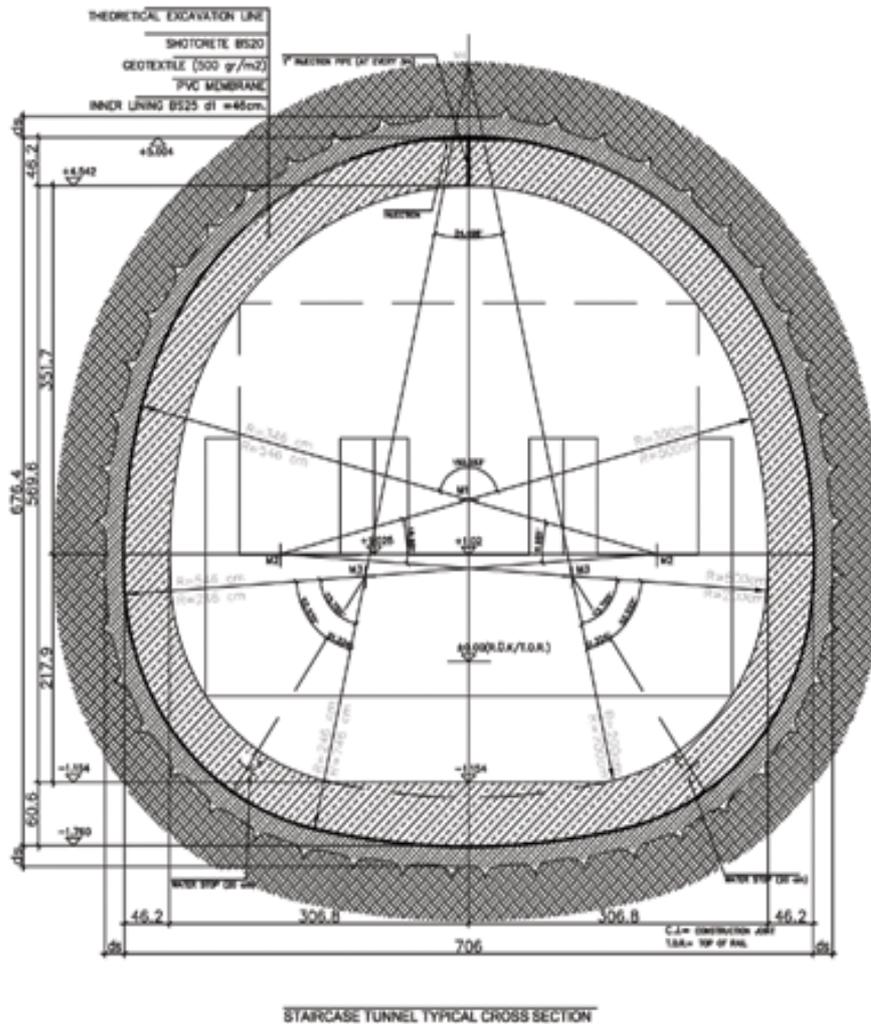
Staircase inclined tunnel cross-section (Türkerler-Limak, 2004)
